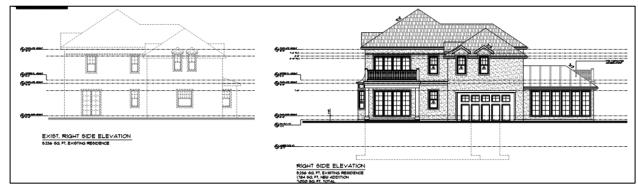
West elevation. Showing existing (left) and new garage entrance, lanai, window changes, and conservatory (right).
